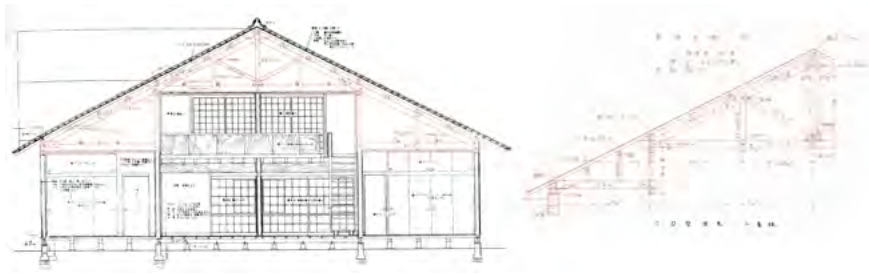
Section of Kunio Maekawa House(left). Roof section of C/D-type residential building(right).
